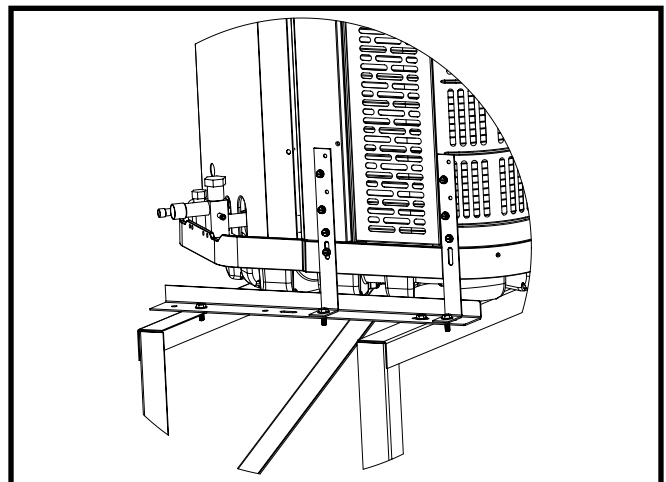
Rear Brackets For Small Footprint - Control Panel Left
